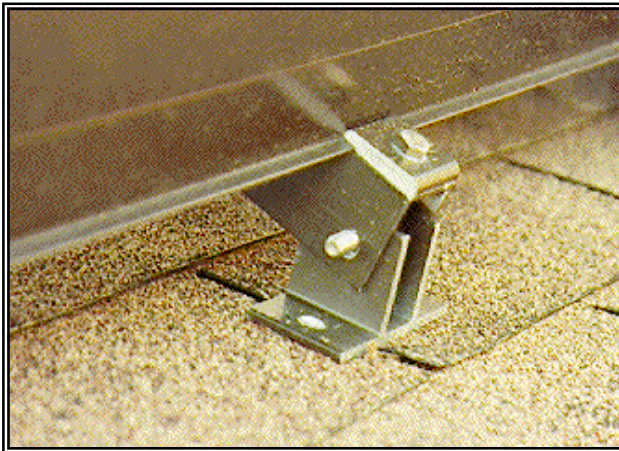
Simple oversight while installing the collector without hardware
